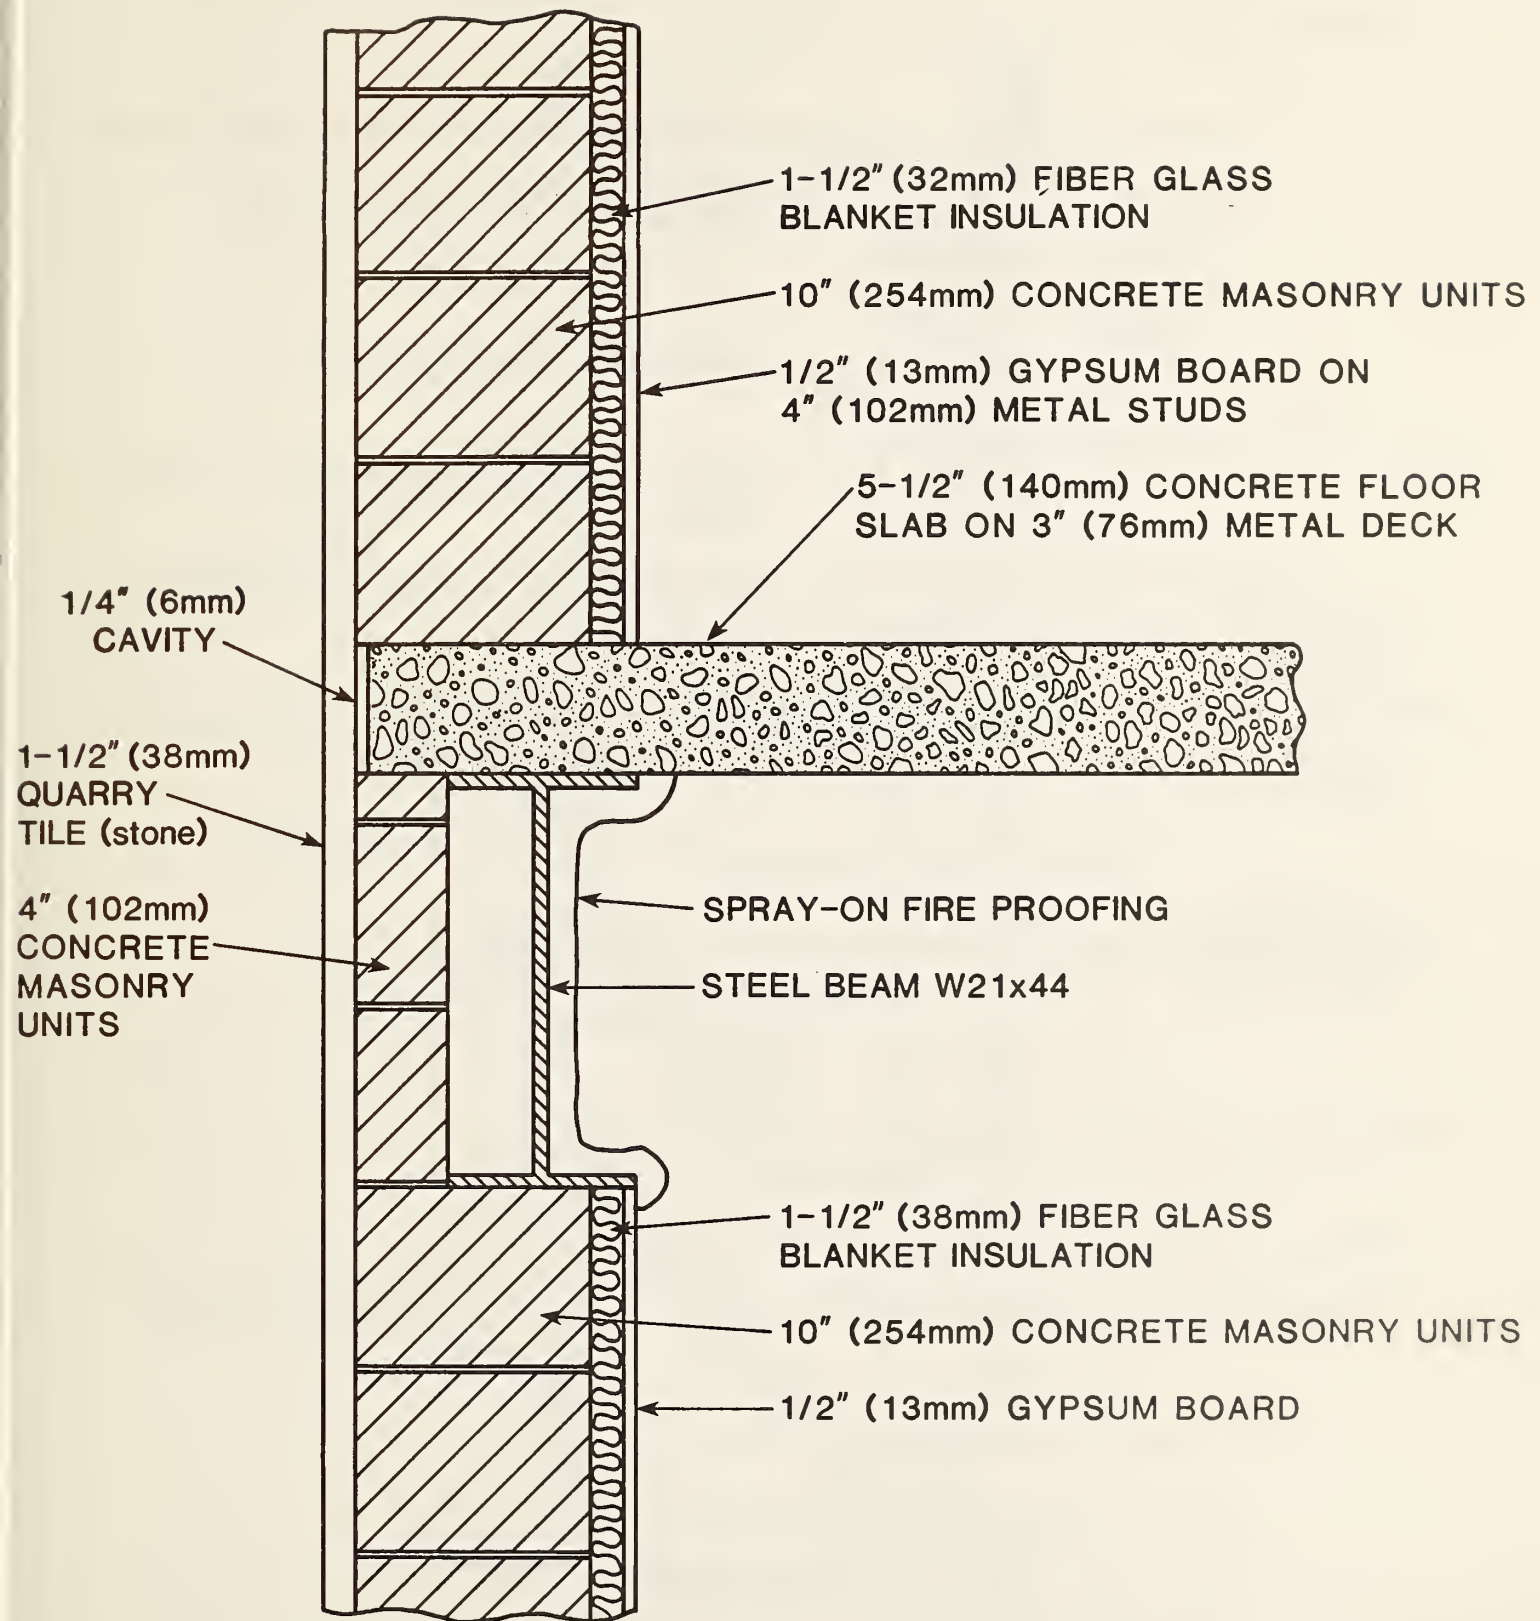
Construction Details of the Exterior Wall in the Ann Arbor Office Building
